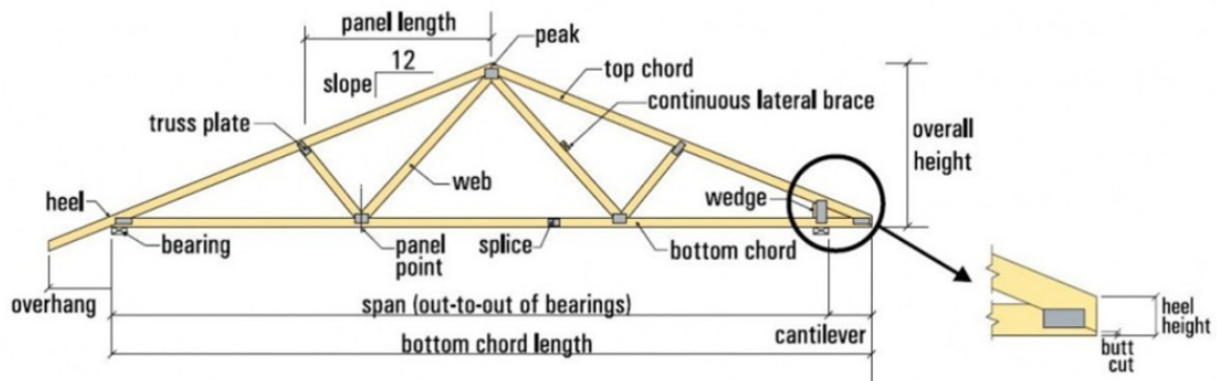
A wooden truss of the Houston restaurant. Trusses like these are made up of chords and webs being joined together by truss plates. (Drawing: [1])
